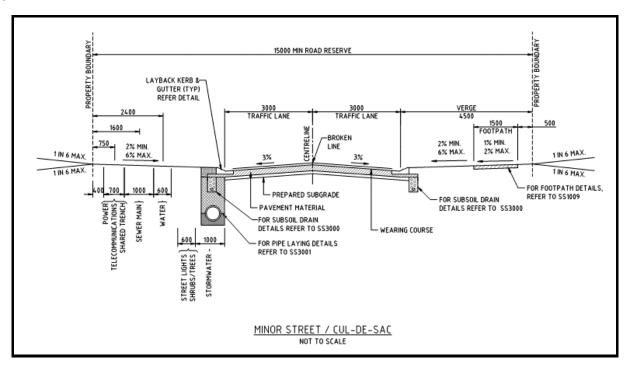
NT Subdivision Guidelines Standard Drawing SS1000 Road Cross Section – Residential
